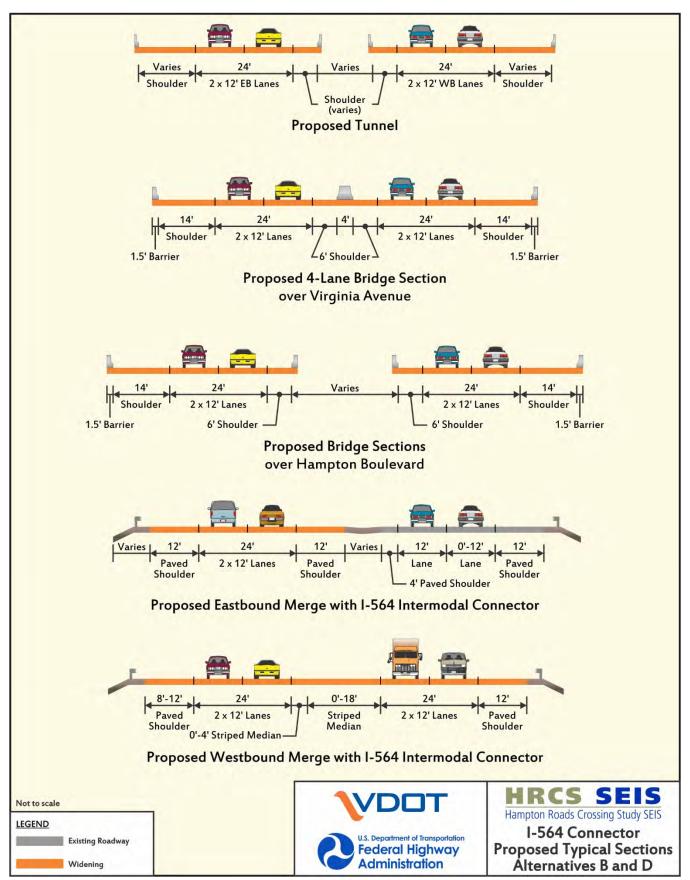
I-564 Connector Alternatives B and D Typical Sections
